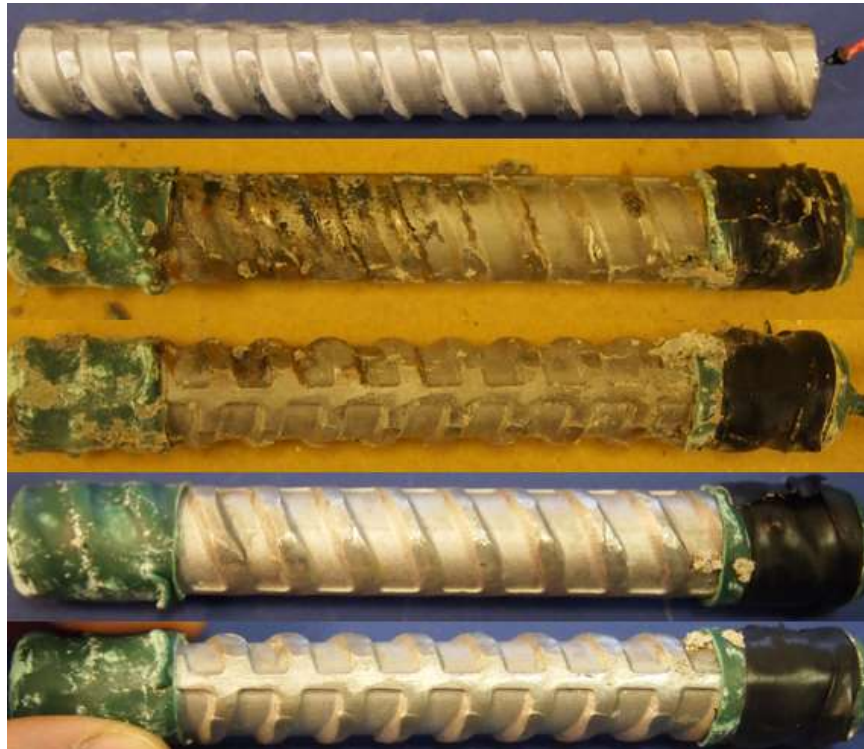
7.5-400 Batch – Corrosion Products on XM-28 AR 8.1. From top to bottom, a) original specimen, b) & c) corrosion products on the specimen upon removal from concrete, and d) & e) pitting corrosion identification on the pickled specimen
